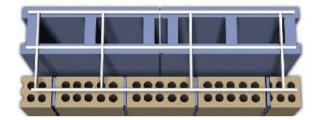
Wall Type 1- Ladder Type Wire Reinforcement
